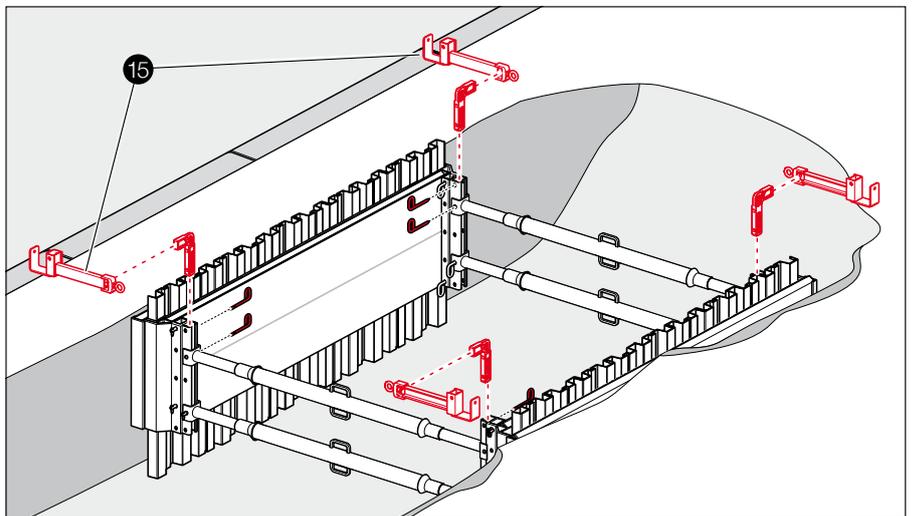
| Example of edge secured with universal lifting eye and holding arm
